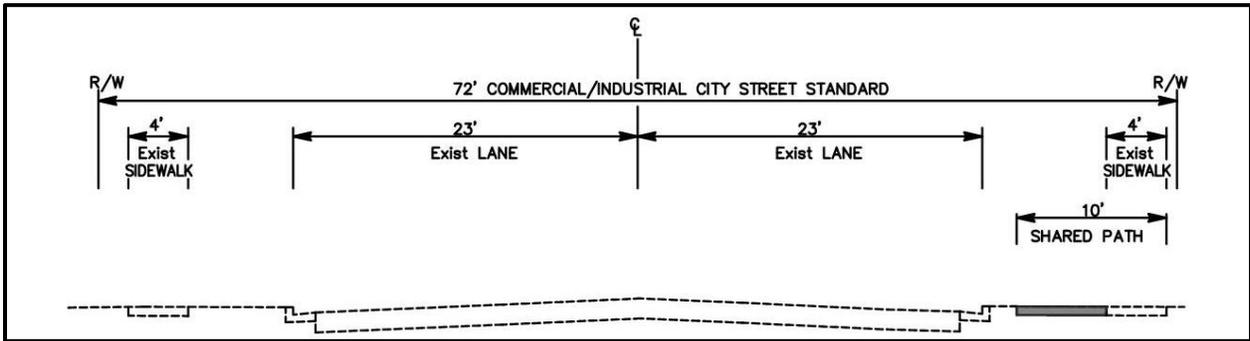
Hannover Place Proposed Roadway Section (Facing East)
